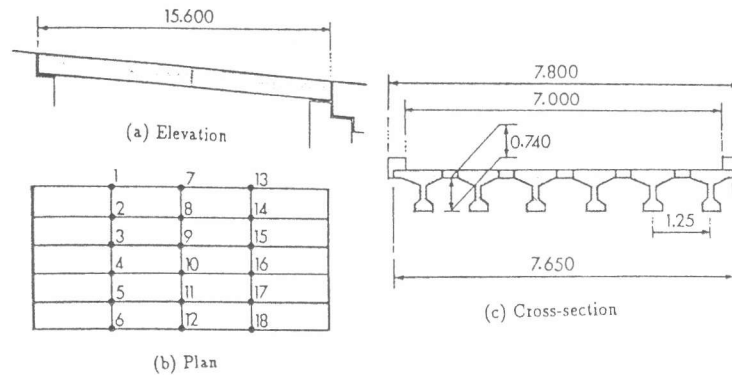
Configuration of Uomi Bridge. (a) Elevation (b) Plan and Notation of Nodes (c) Cross-section
